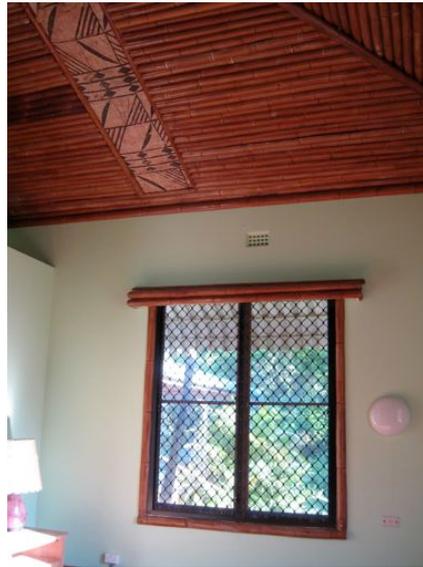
Top left. Studio interior with raking ceiling. Note infilled south facing rooflight.
